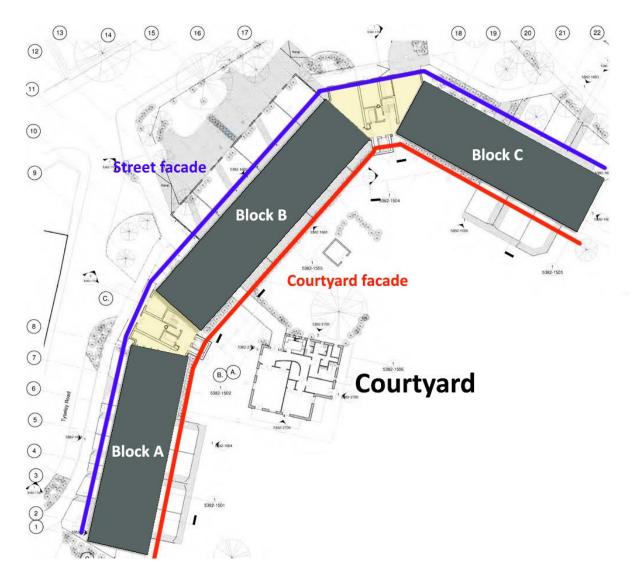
The plan of Wilmcote House (ECD Architects, 2012).
